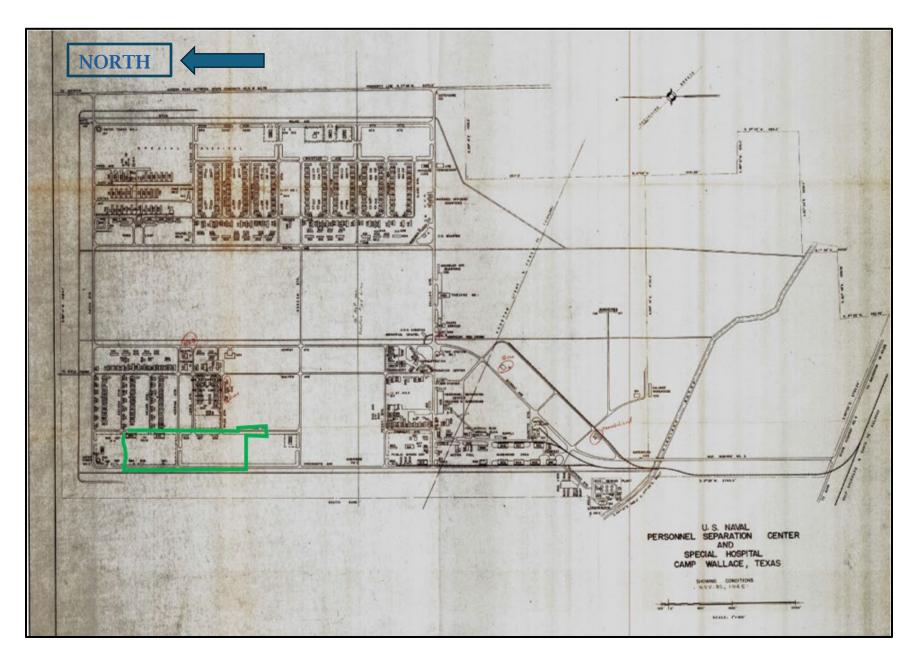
UH Coastal Center / 1945 Camp Wallace map with project site outlined in green.
